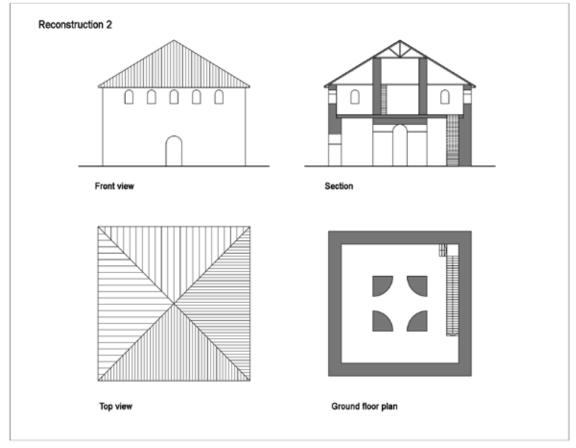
Schematic reconstructions of the watchtower (drawing by B. Popović)
